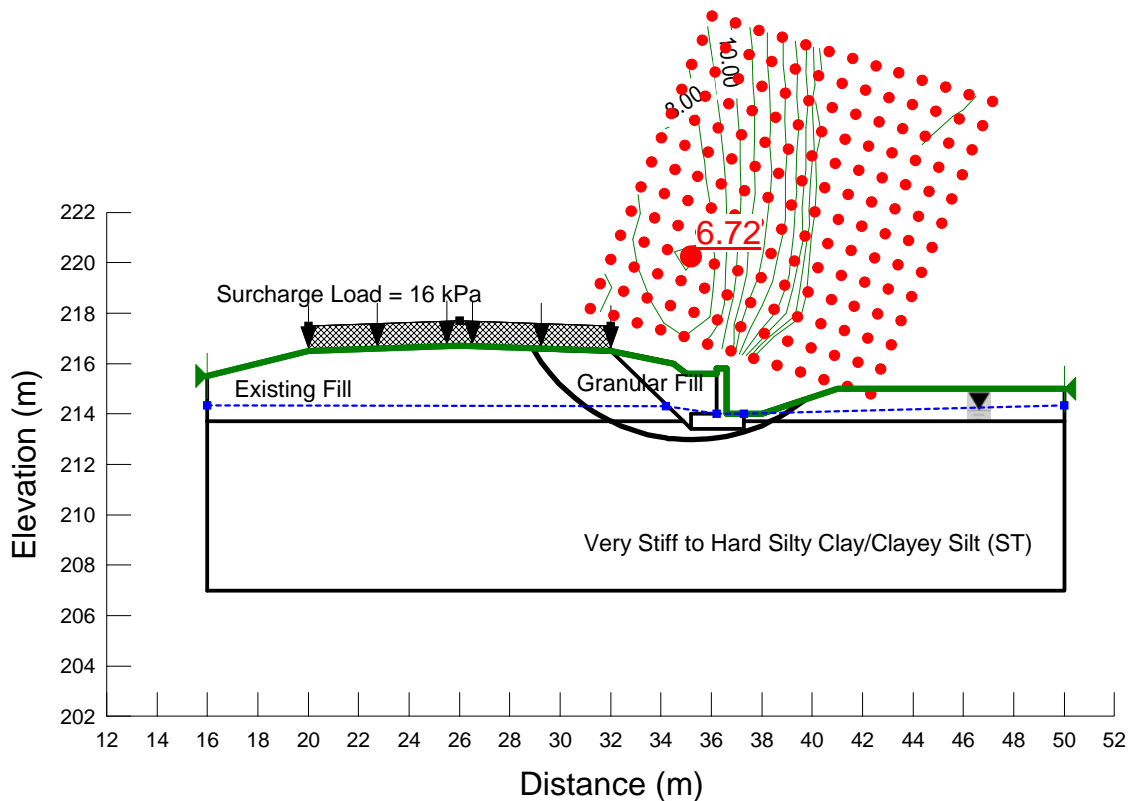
Slope Stability Analysis of Proposed Retaining Wall - Sta. 25+232
